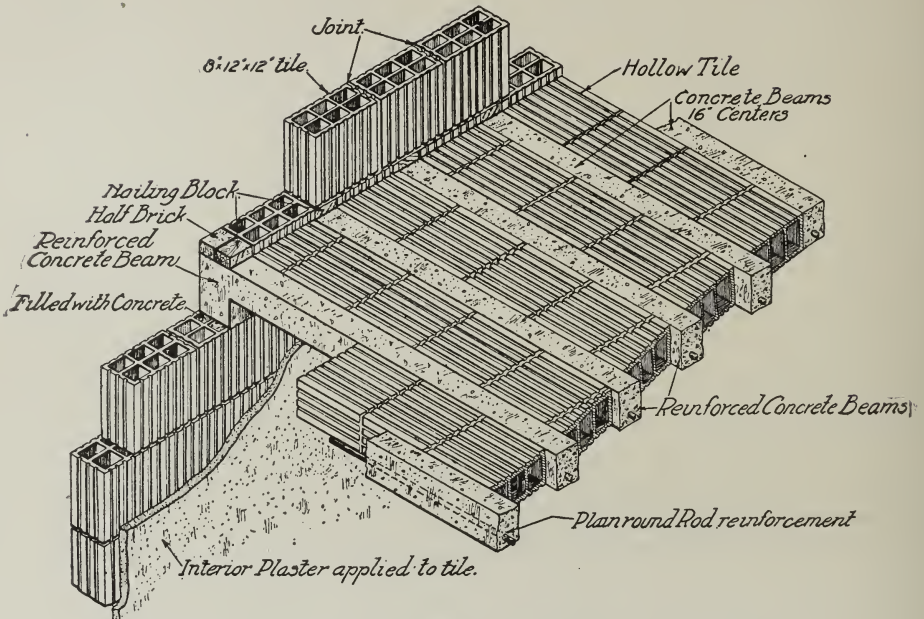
Terra-cotta Outside Wall with Tile and Concrete Floors.
